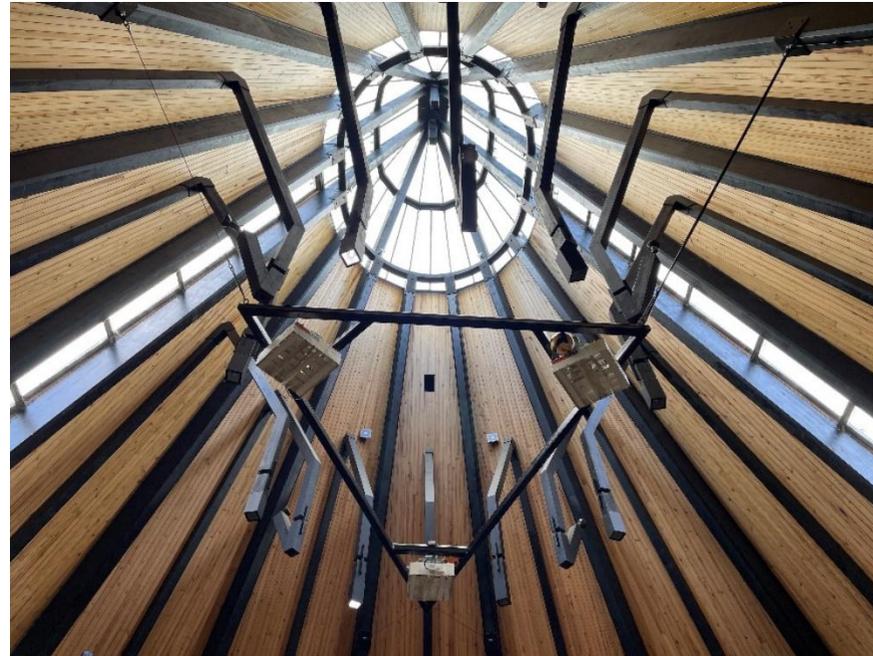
Current view of the roof structure, lighting and other equipment within the Chapel
